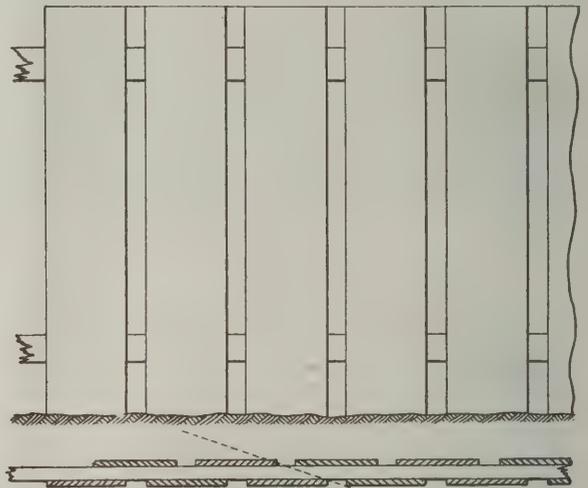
Elevation and Horizontal Section of a Close Boarded Fence
